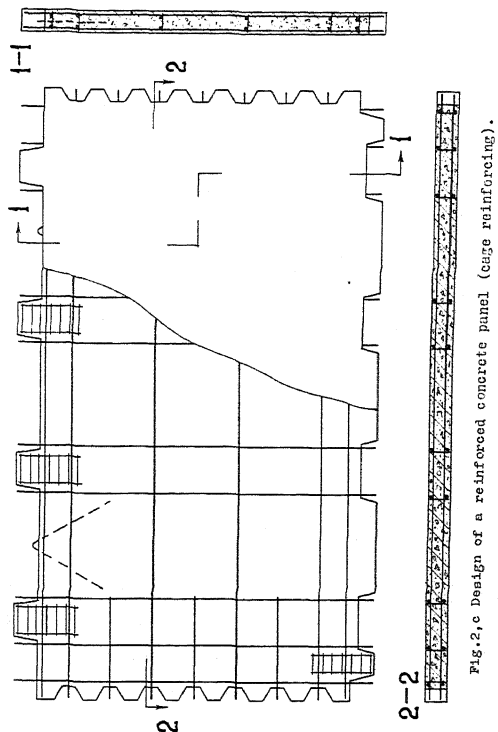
, c Design of a reinforced concrete panel (cage reinforcing).
